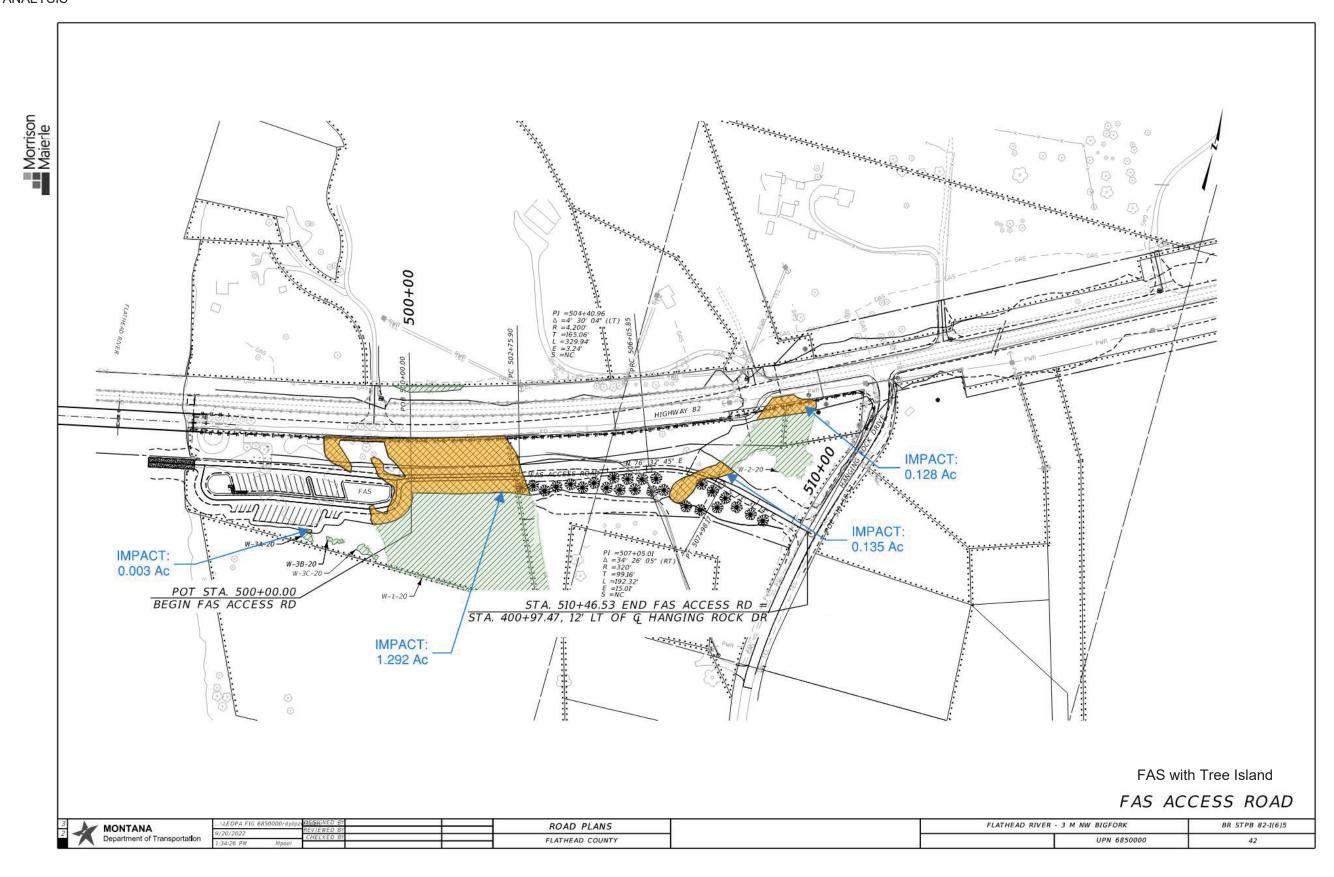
FAS Design Option 3 – FAS Parking Lot with Tree Island
